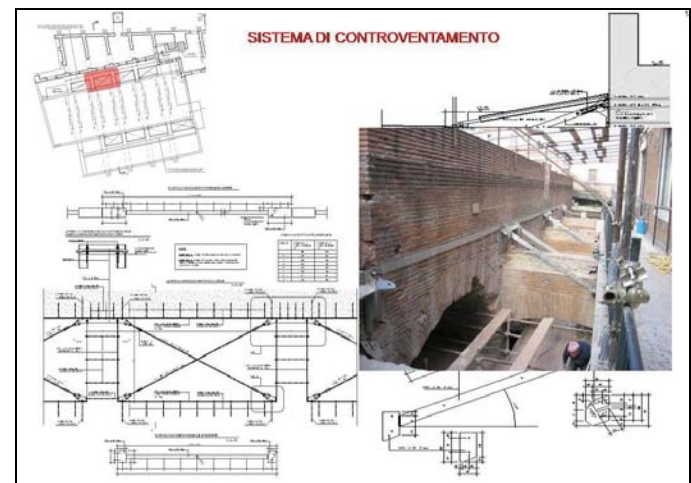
Detail of the connection system between the Great Hall and the Central Body
